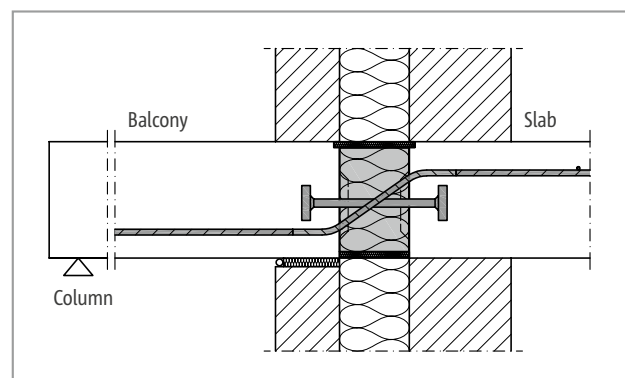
Schöck Isokorb® XT type Q-P: Connection supported balcony with thermal insulating cavity masonry
